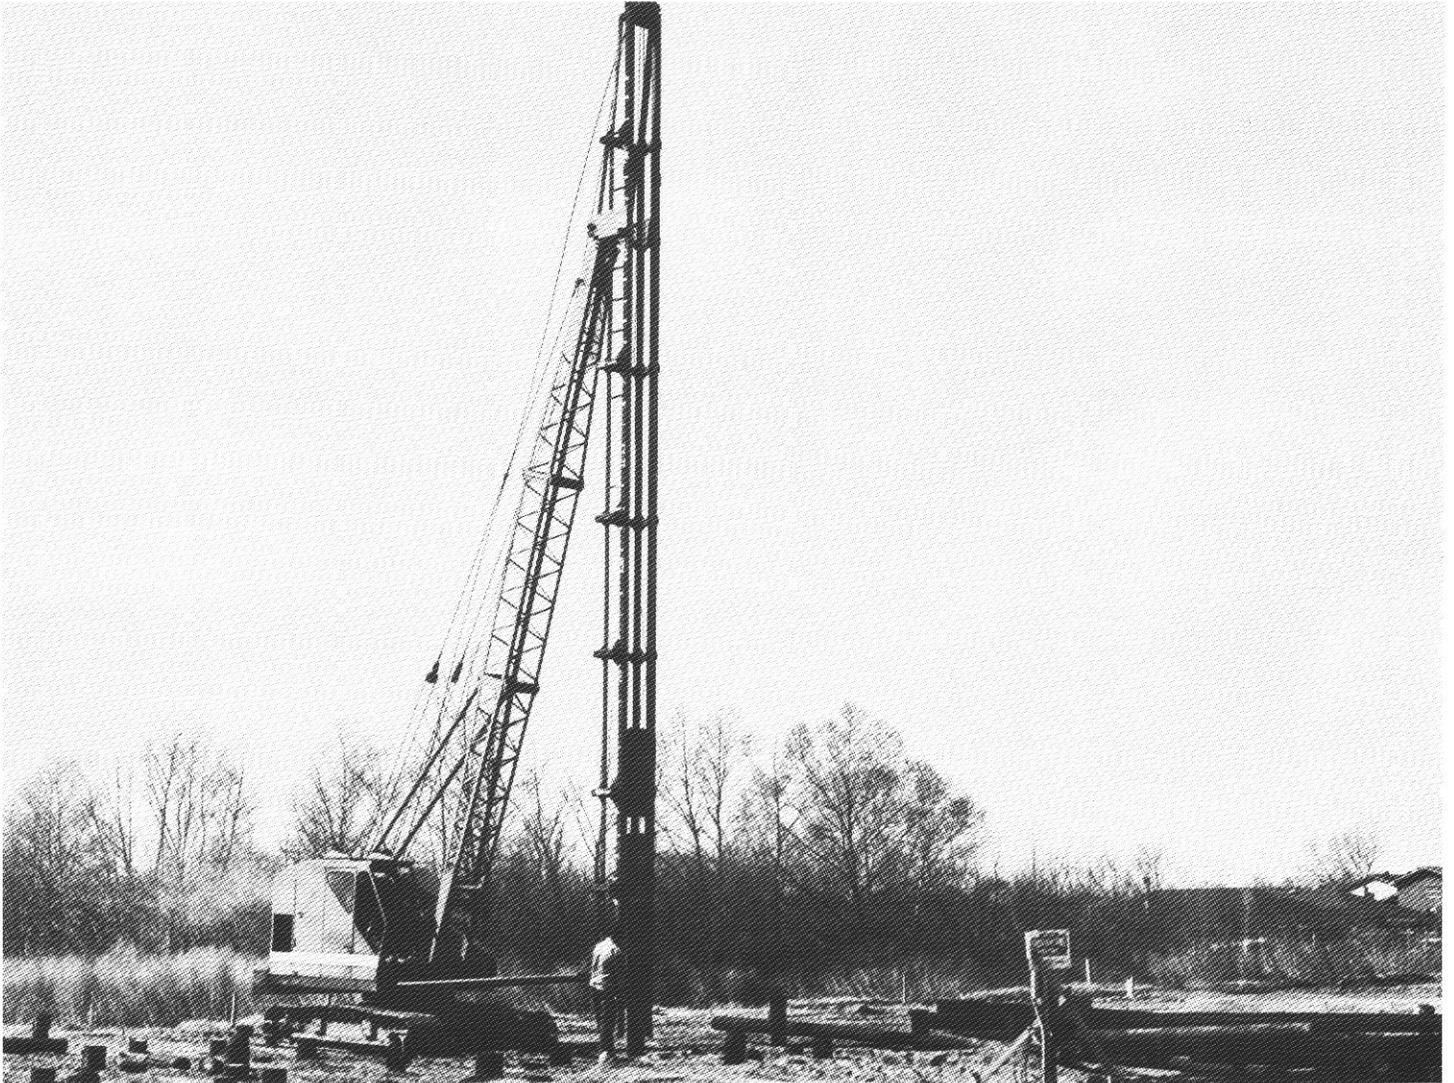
Wooden pilings are driven deep into the soil to help support the foundations of houses and commercial buildings without basements on Allemands muck, drained.
